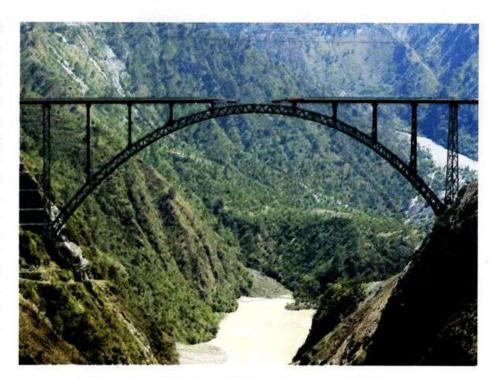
Chenab Railway Bridge, Jammu and Kashmir
